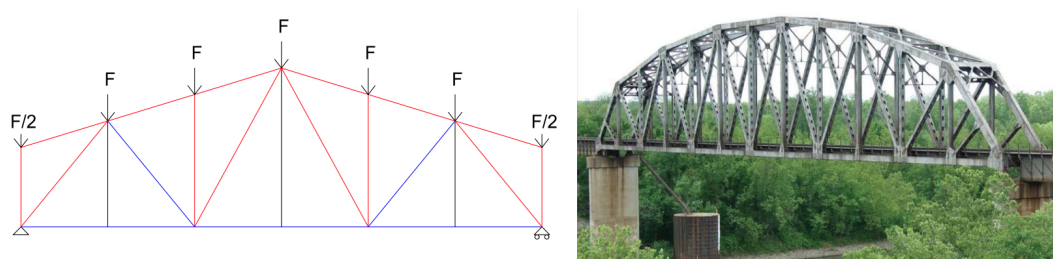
Warren truss scheme and application example: BNSF Railroad over Verdigris River
